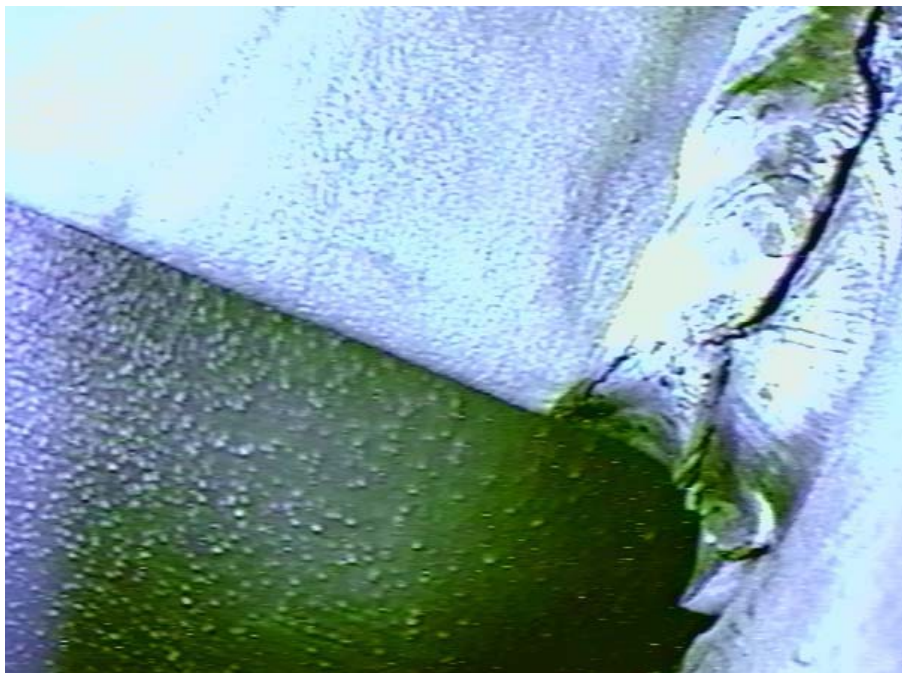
Bottom weld crack at location 10 identified in Figure B-19.
